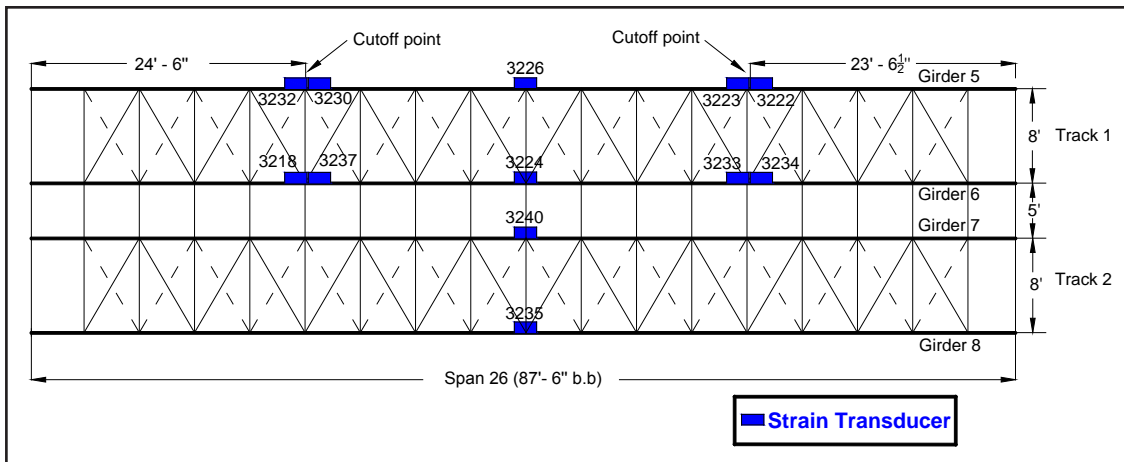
Location of Strain Transducers Installed on Various Locations in Span 26 of the North Jersey Coast Line MP 0.39 (River Draw) Bridge
